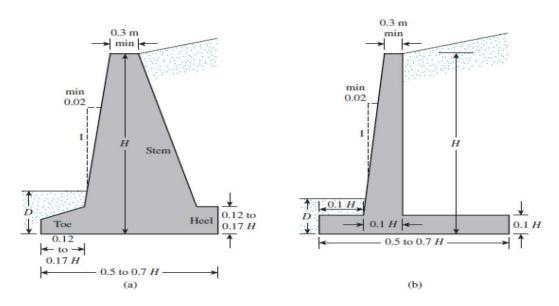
Approximate dimensions for various components of retaining wall for initial stability checks: (a) gravity wall; (b) cantilever wall.
